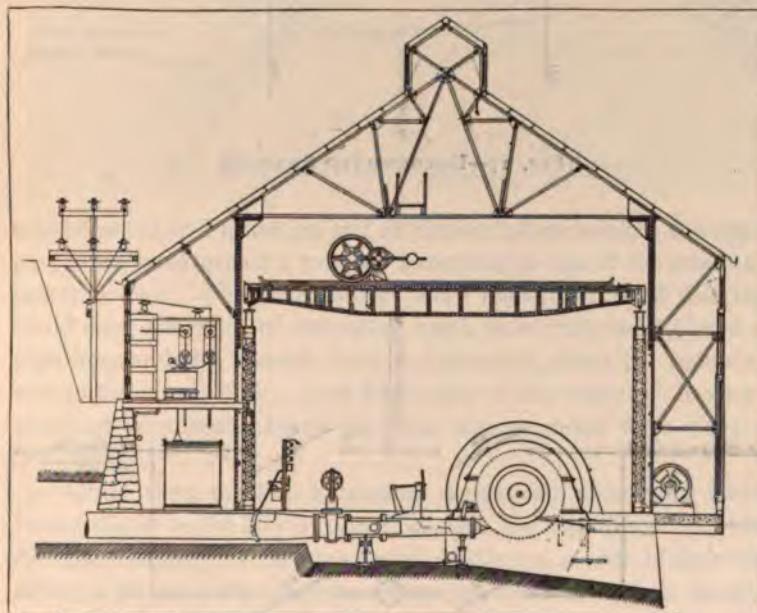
NEW ARRANGEMENT OF FIREPROOF SWITCH GALLERIES, ETC.
